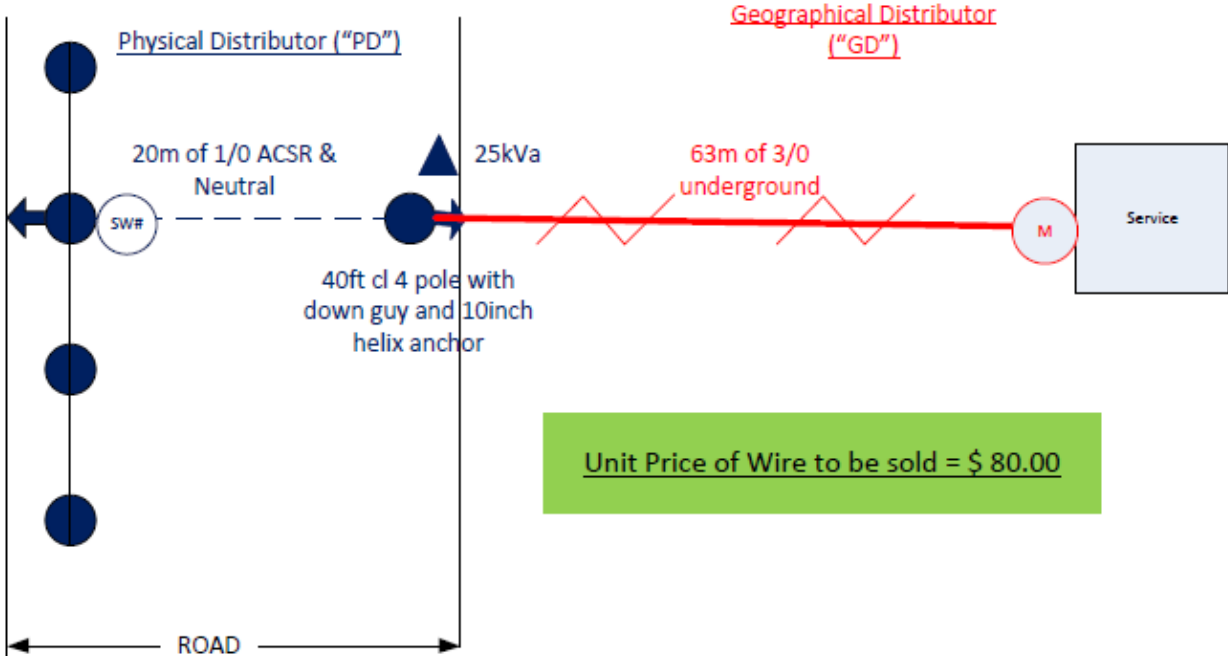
Primary “PD” supplied transformer, switch and Road crossing
